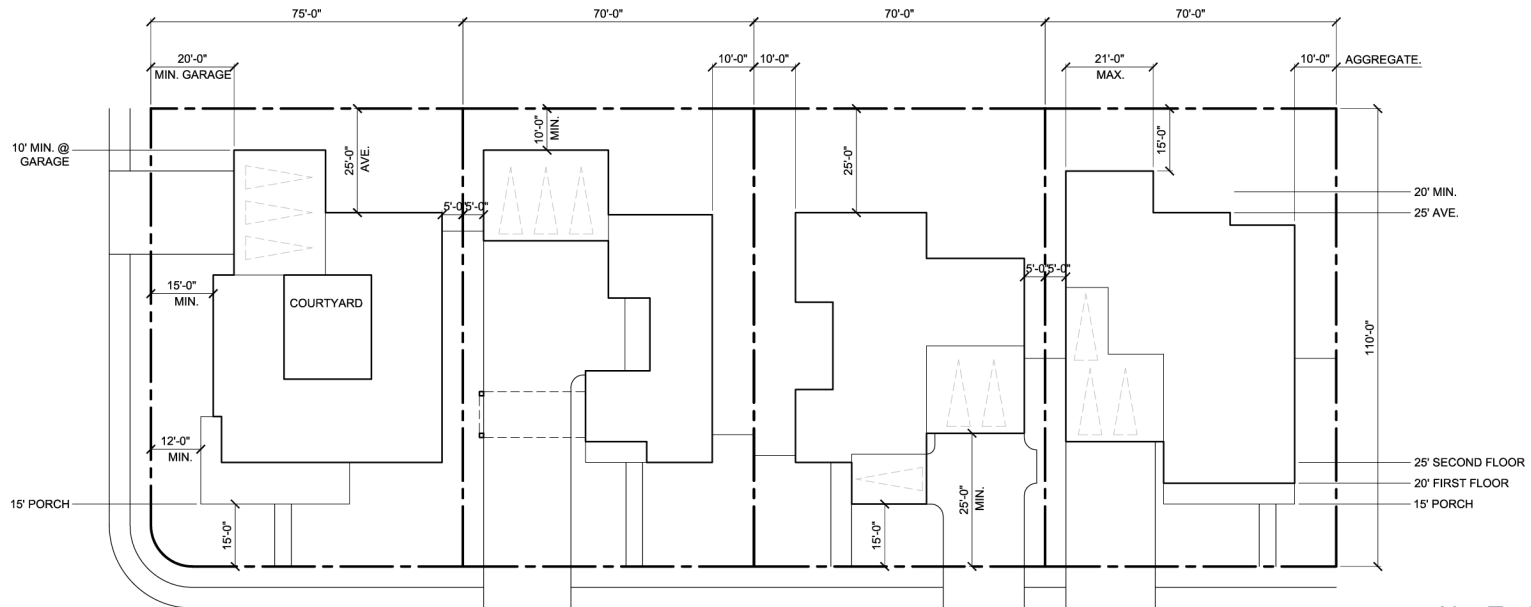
Single Family Detached - Larger Lot Typical Layout
